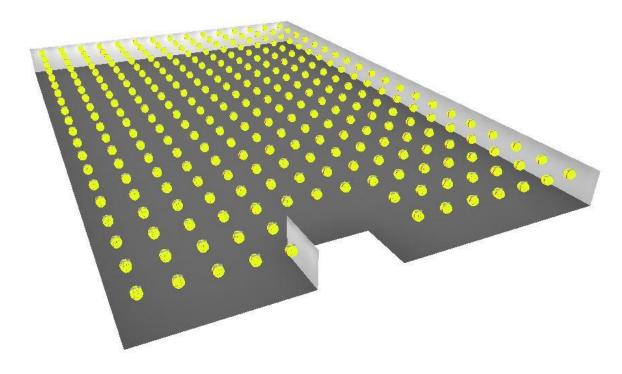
Goods Manufacturing Unit- Manufacturing and Storage area
